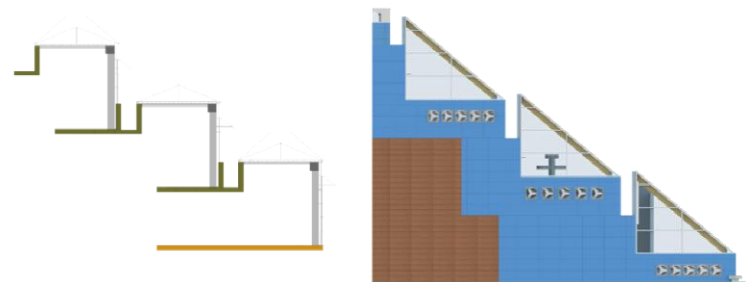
Elevation comparison of original greenhouse (left) and TBD custom design (right)
